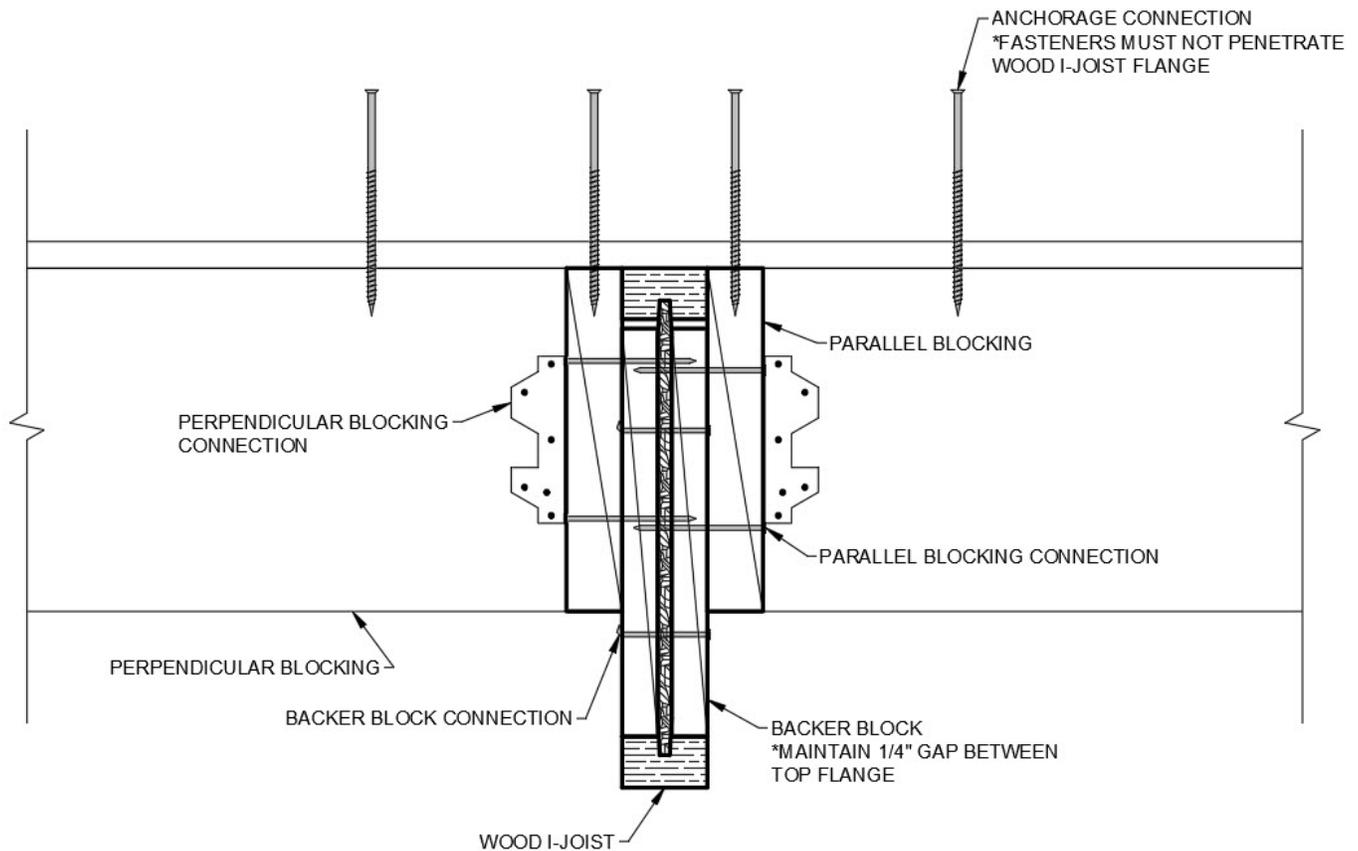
Conceptual detail for connecting anchorage to I-joist. Specific connection design and detailing to be provided by fall-protection system engineer or designer of record.
